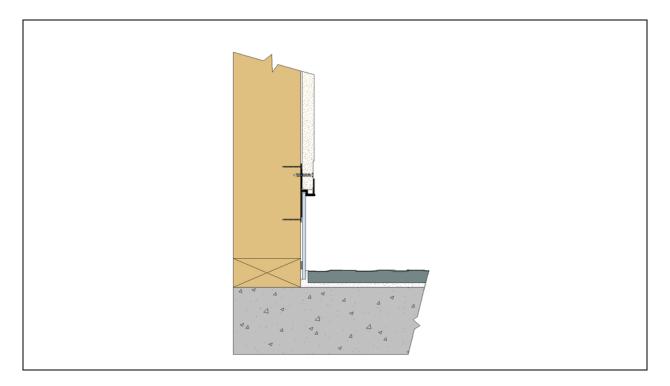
A conventional installation. The floor is installed first and the baseboard is installed second.
